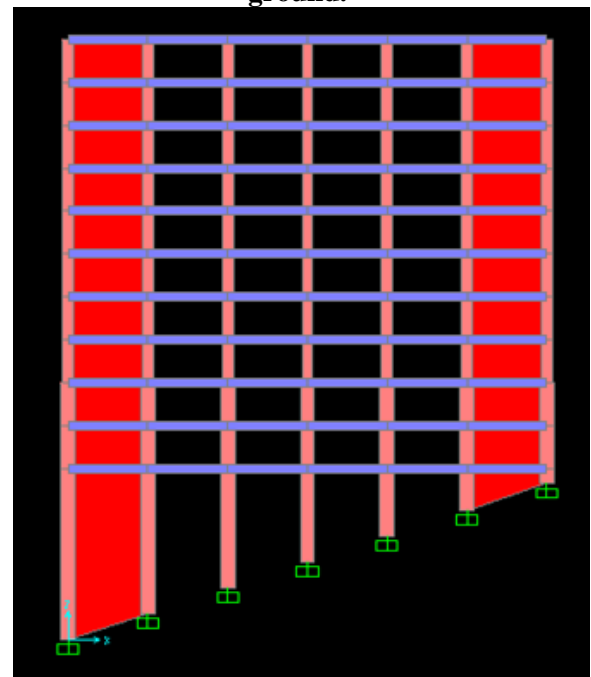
Building model with shear walls provided at peripheral corners on 20° slope ground.
